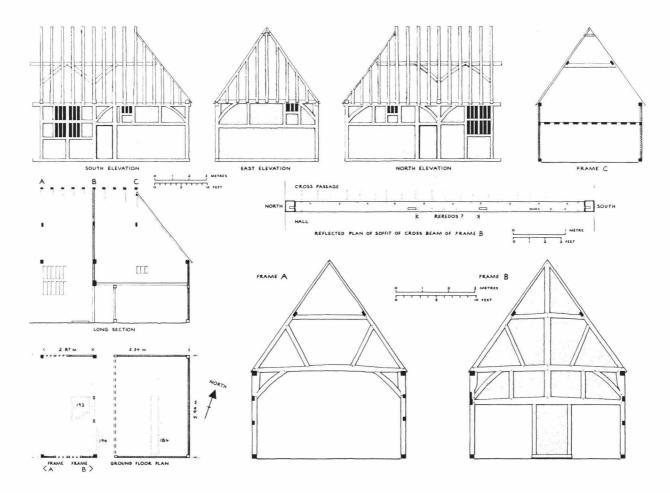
Period 2b: The timber-framed building. Frames are shown reconstructed as far as the evidence allows. In the ground floor plan the archaeological layer numbers are shown.
